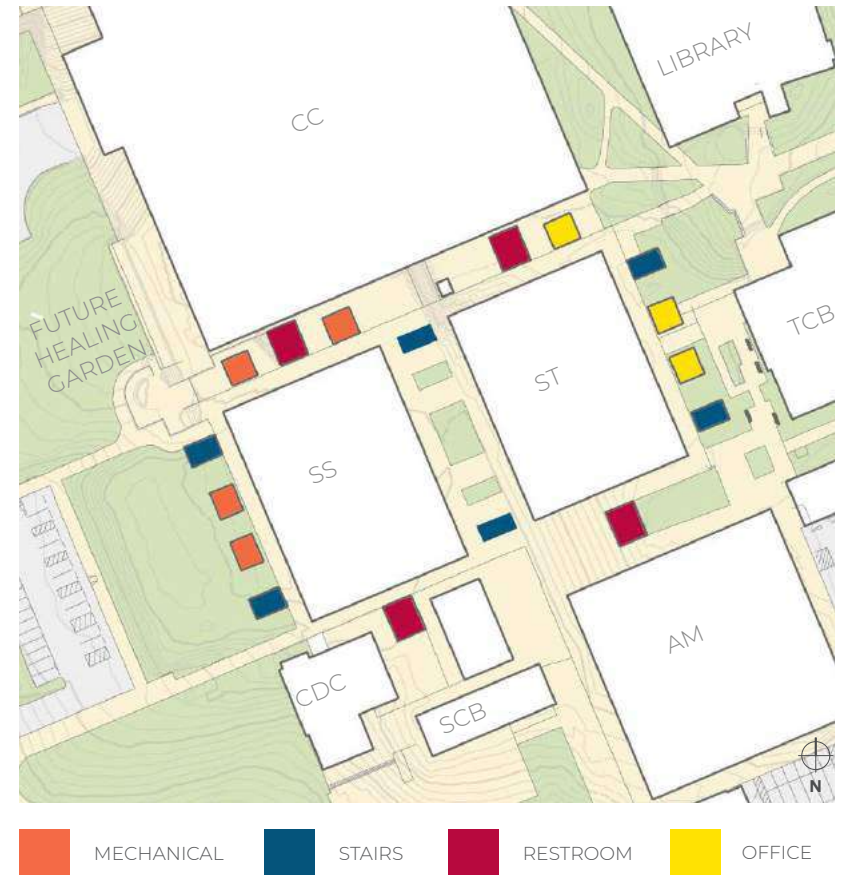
A variety of functions are currently housed in concrete structures between buildings. Office and restrooms may be added to adjacent buildings during renovation, allowing for removal of some of these structures.
